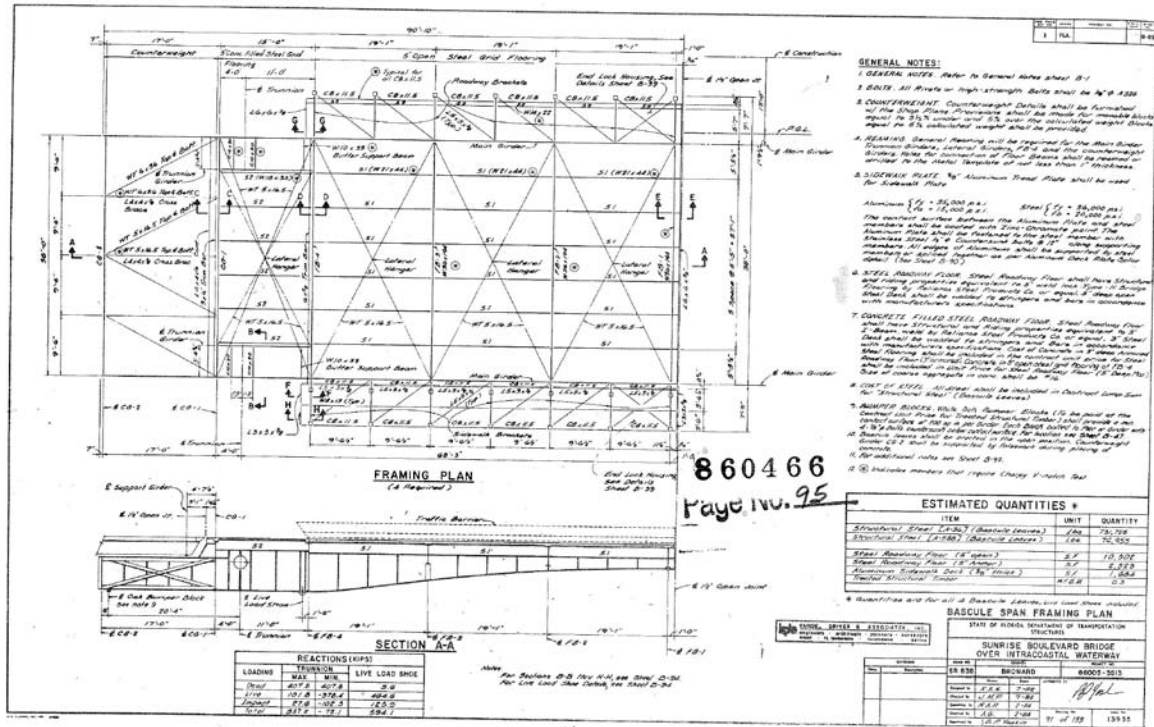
Construction Plans of Sunrise Blvd. Bridge
